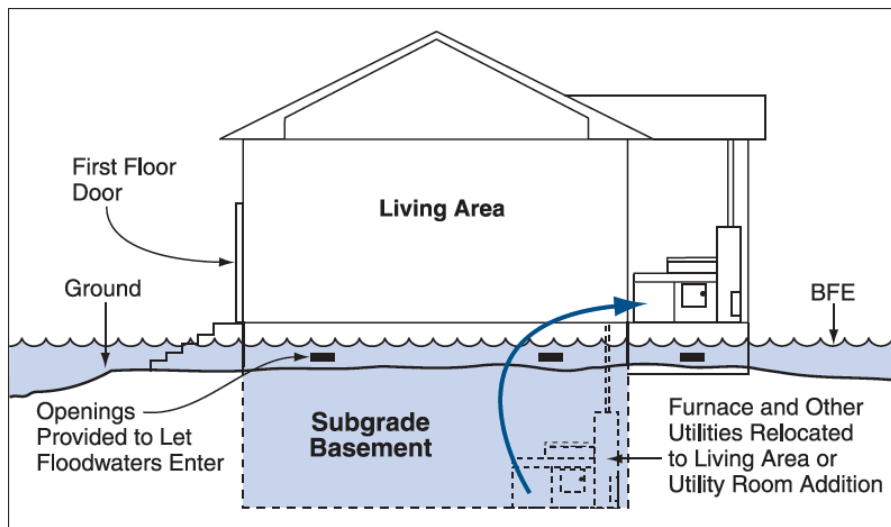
Example of Wet Floodproofing (Source: FEMA P-312)
